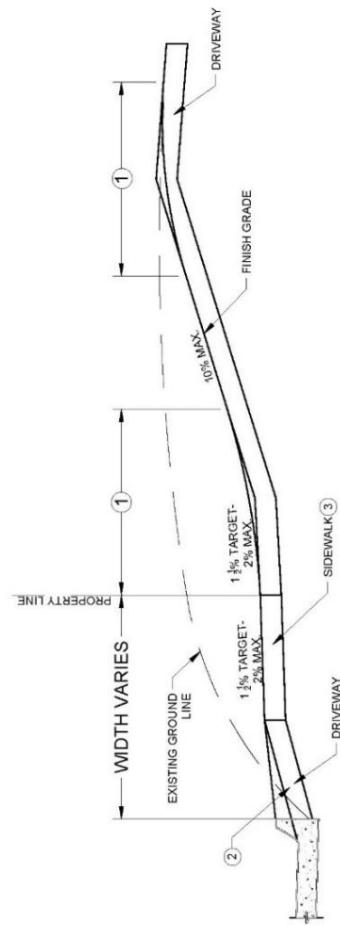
R	STANDARD ROAD PLAN	REVISION 3 10-26-15
